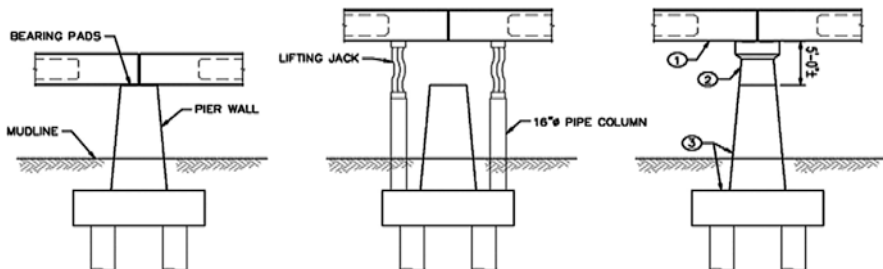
LOSSAN Rail Corridor uses a Moffatt and Nichol concept of precast piers and caps to allow insertion of additional pier segments if needed to adapt to flooding hazard [26]
